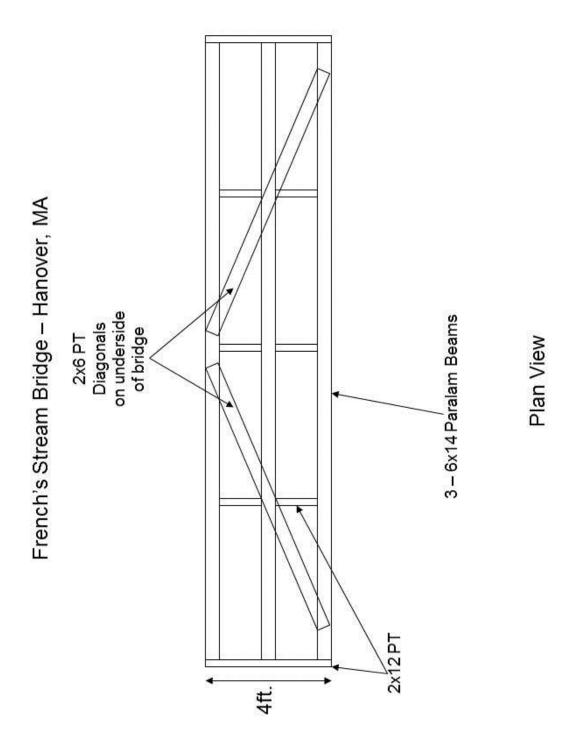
Past bridge designs, intended to be used again for the proposed Torrey Brook Bridge project. This Plan View shows the underside of the bridge; "Paralam beams" are 38-foot stringers.
